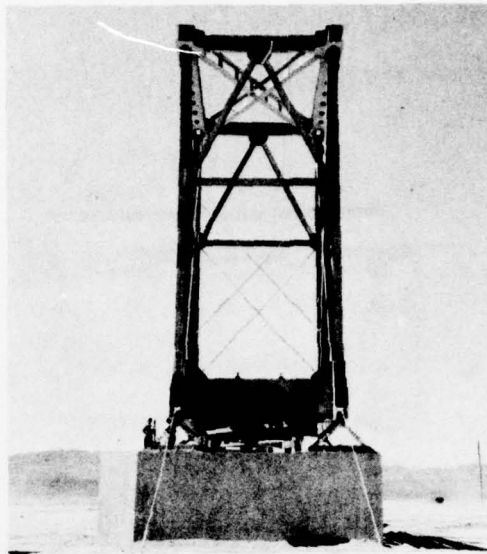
Preshot, Truss Bridge Section, 3.4a (End View)
